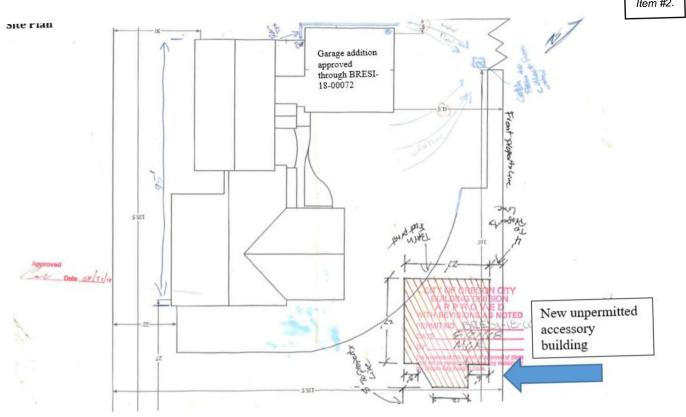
location of newly built accessory building. Note the Applicant utilized a previous plan created and approved for BRESI 18-00072, which reviewed a garage addition to the main house. The approved stamp is for the previous approval and not the newly built accessory building.
